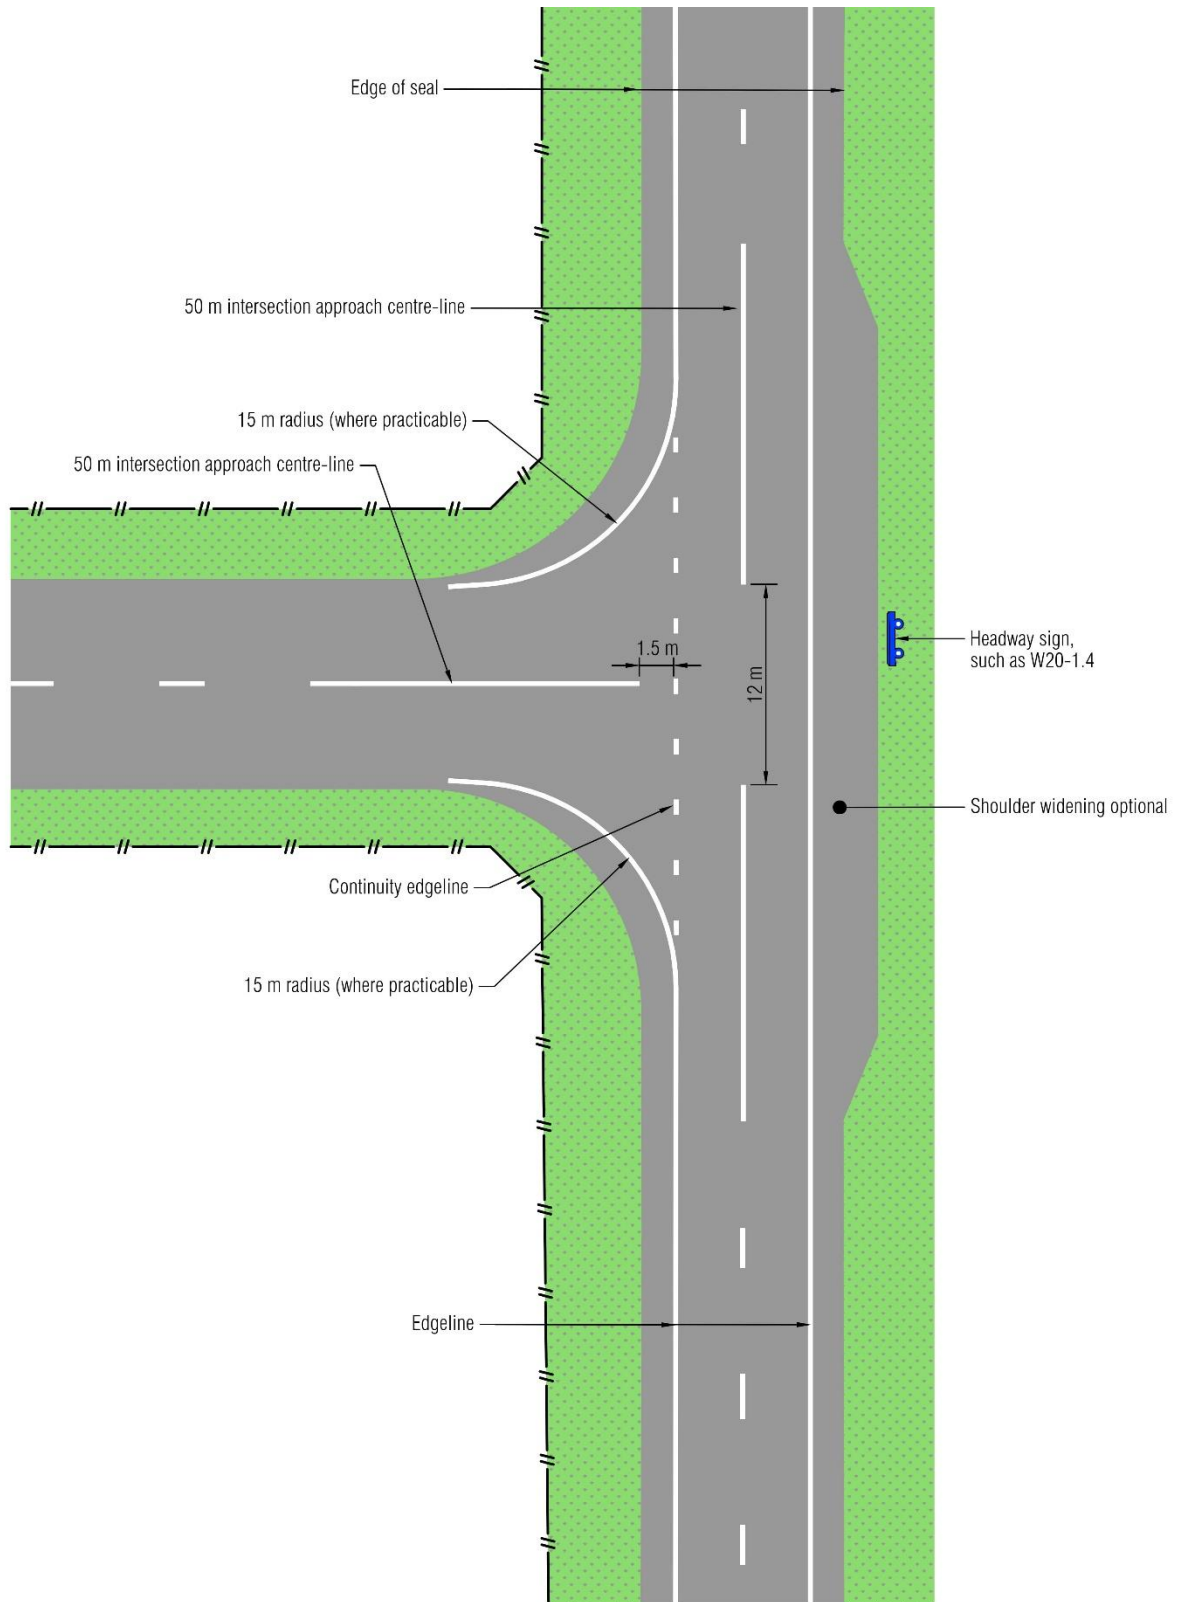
Markings for rural uncontrolled intersections with a sealed side road
